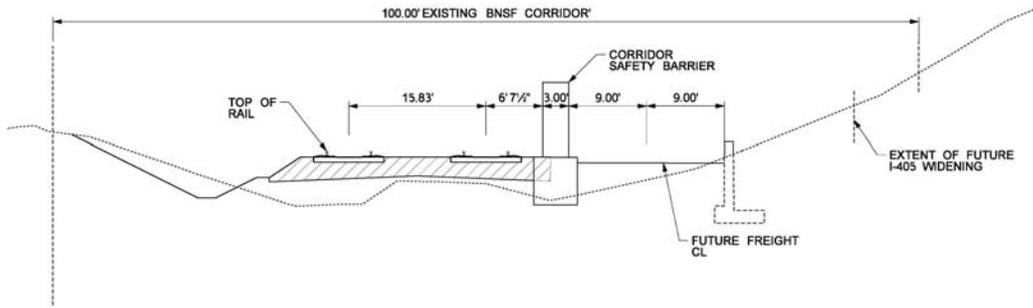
Absolute Minimum clearance typical section (STN 2066+00)
